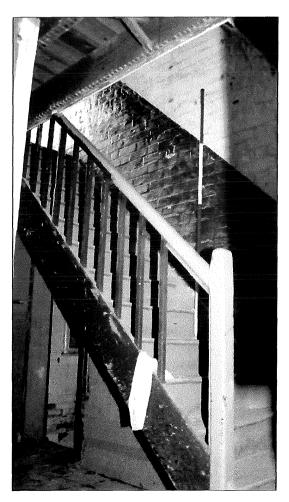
Main staircase from the Crescent Works inserted against the original external wall of the Walton Works. The plinth below the stairs is an indicator that this wall was external when built
